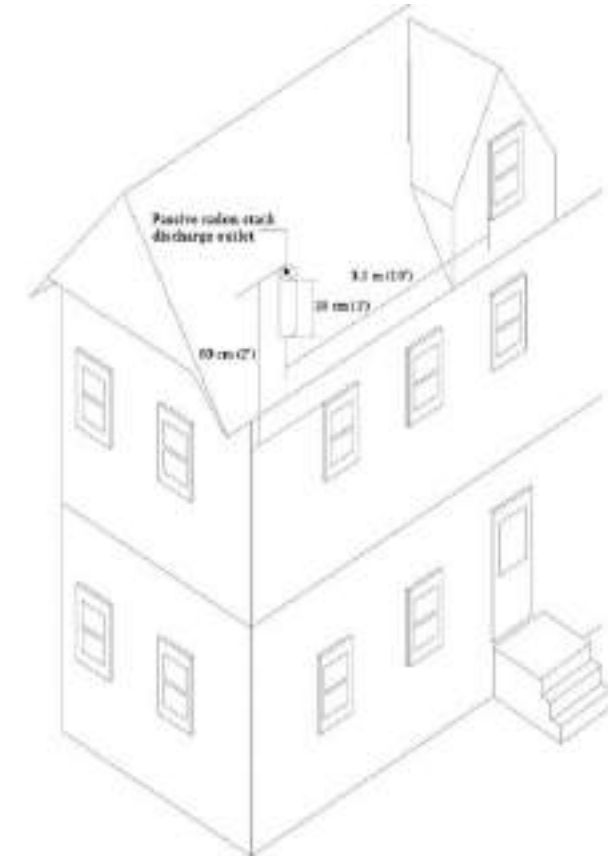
Conceptual illustration of rooftop passive stack discharge geometry showing proximity to windows and height above roof
